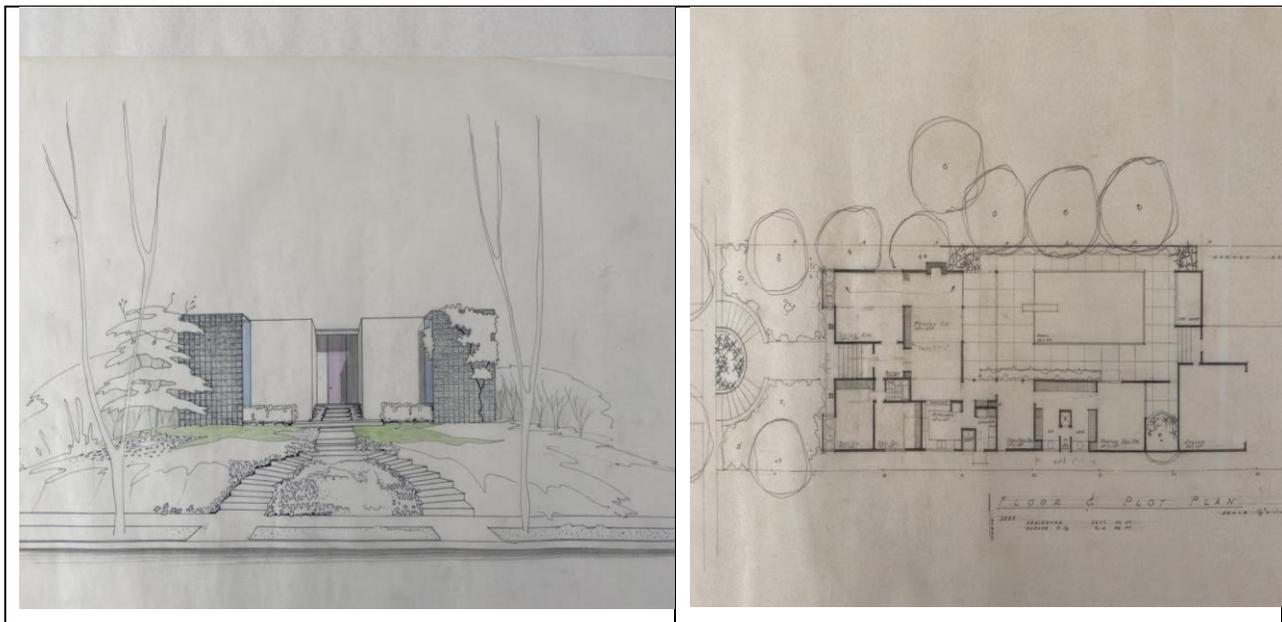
Original concept drawing and floor and plot plan, including a swimming pool. A scaled-down version of this pool was installed by the current owners of the residence in 2022 (Edward A. Killingsworth papers 1959; City of Long Beach 2022)
